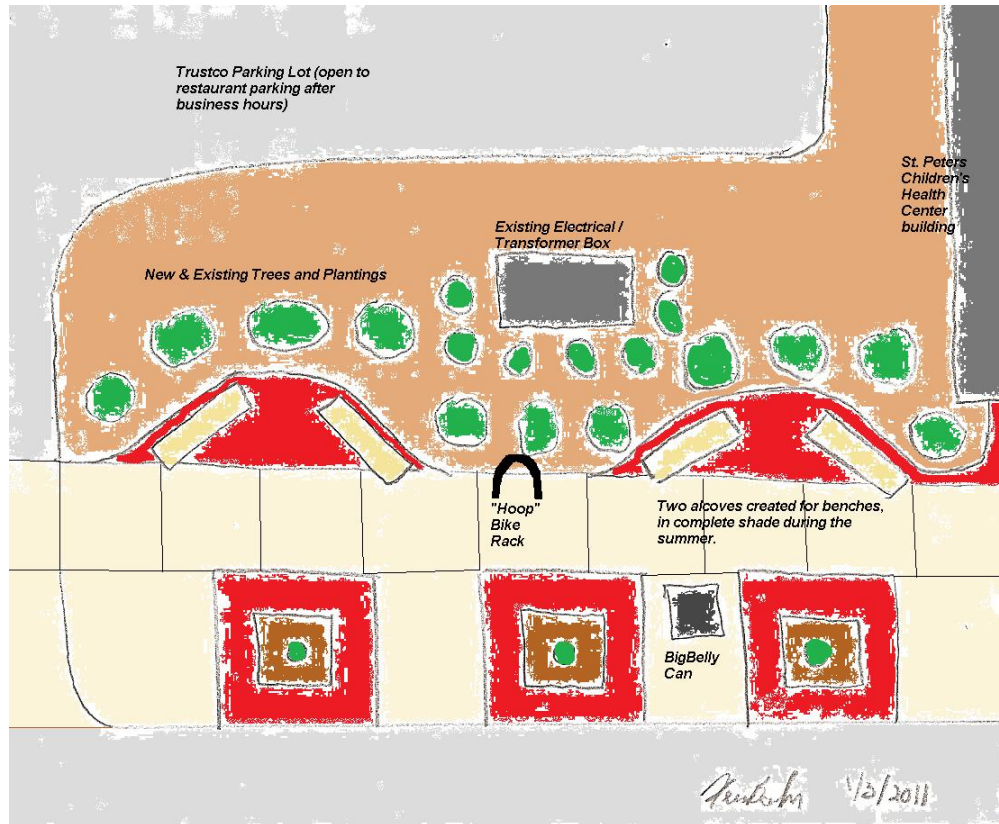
Proposed layout of the four Trustco benches. Illustration by Kevin Boucher.
